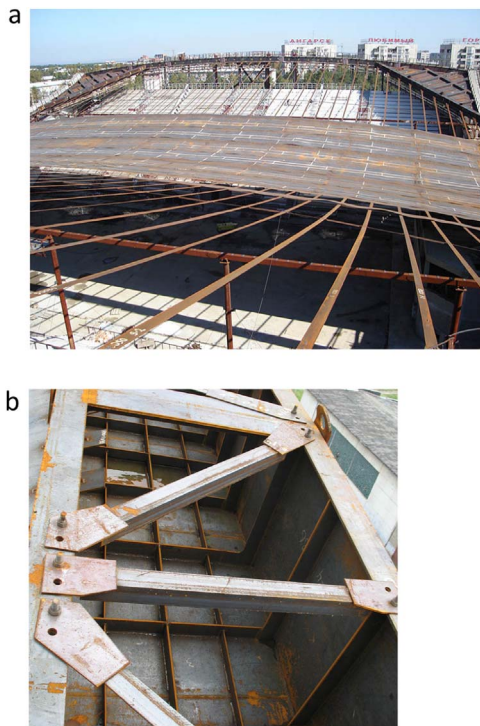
Ice Palace of Sport “Ermak” in Angarsk (Russia) in the process of building. a) Lay of the steel panels on the temporary elements of the bed. b) The support contour before placement of concrete.
